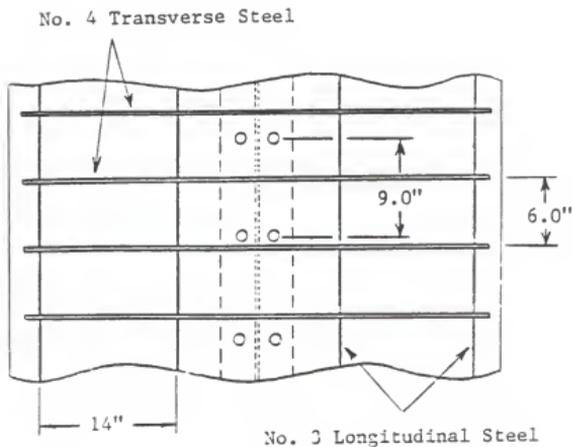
Plan View of Prototype Slab, Reinforcing Steel, and Studs
